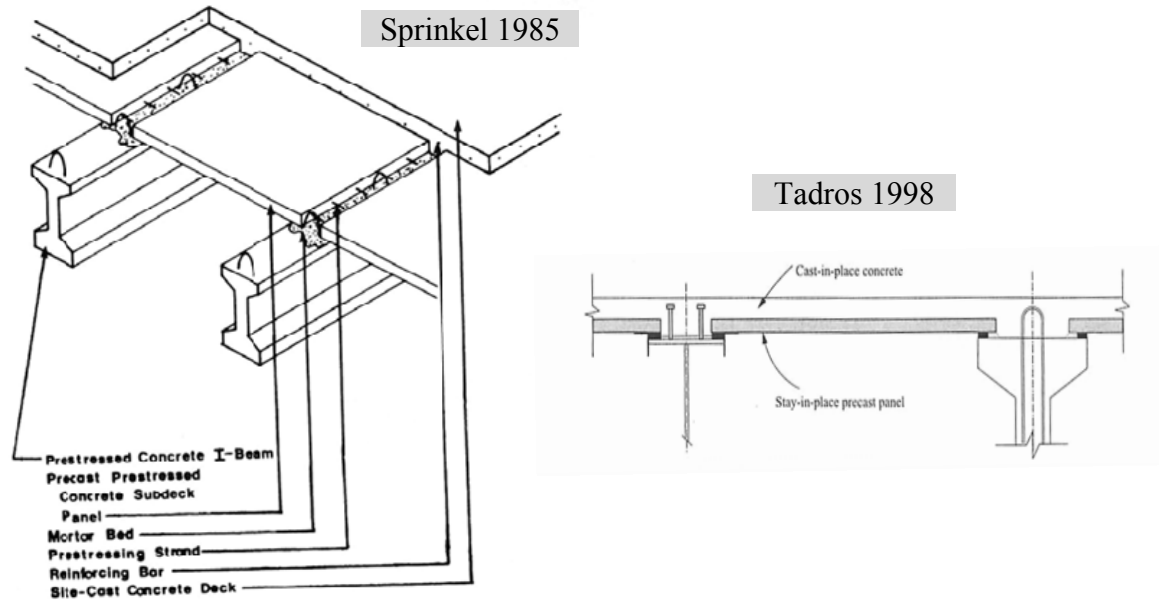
Typical Partial-depth Precast Concrete Deck Panel
